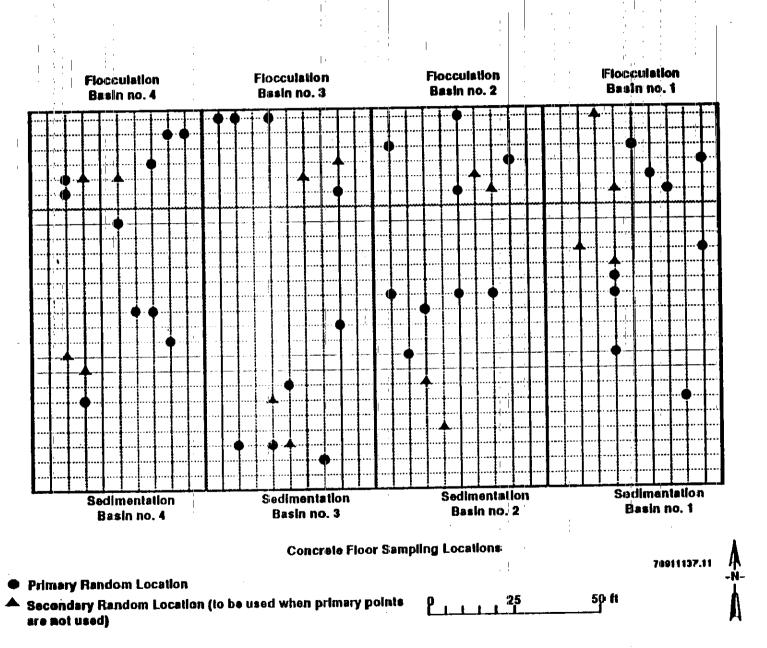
Concrete Floor Sampling Locations for 183-H Basins.
